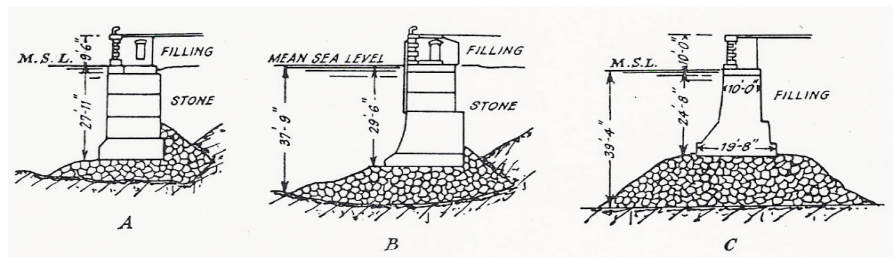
Cross-sections of quay walls at Genoa 1905 [Cagli and Bernardini 1905]
